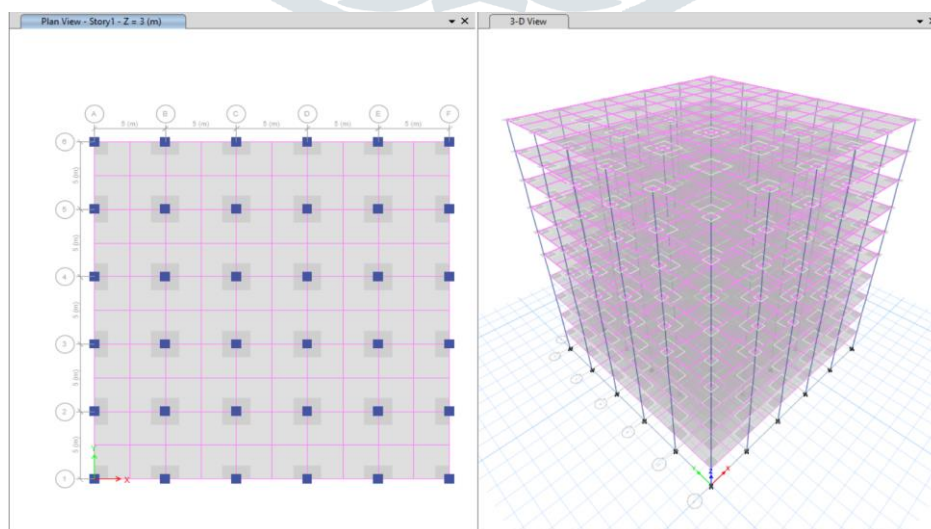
Plan and 3-D View of flat slab structure with drop panel
